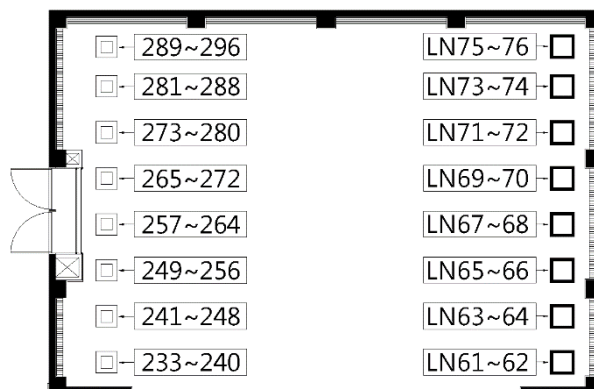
Above Rear Stage Cable Reel Lighting Circuit Layout
